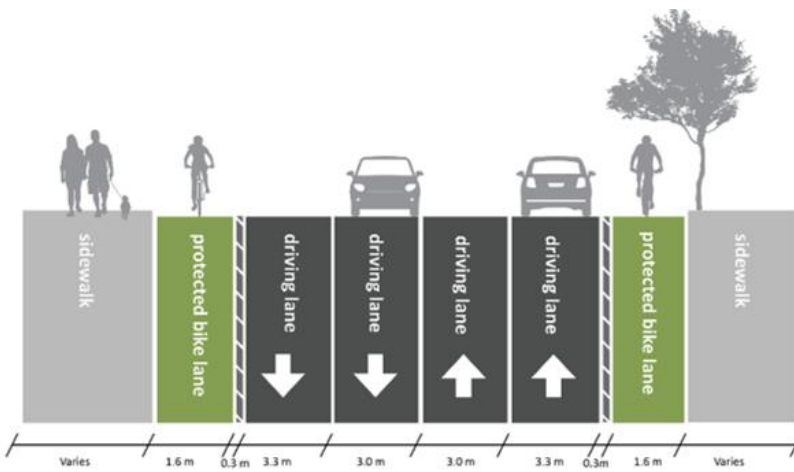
Danforth Avenue Complete Streets Design Option A Cross Section
